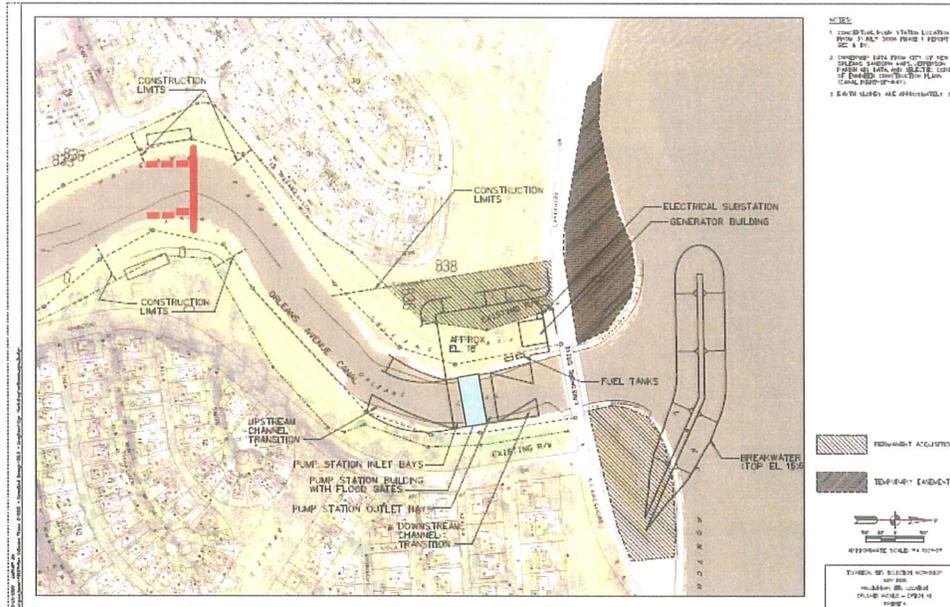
Conceptual plan view of the Orleans Avenue Canal Pump Station and breakwater.
